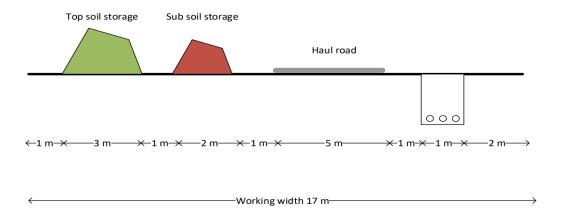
Working Corridor for Cables (source: WSP | not to scale)
